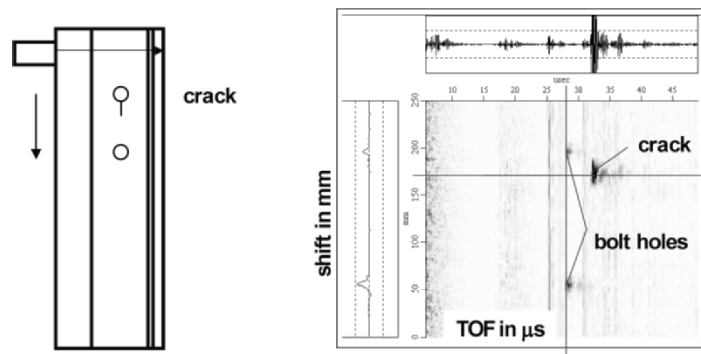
Imaging of a bolt hole crack in a rail by straight-beam.
